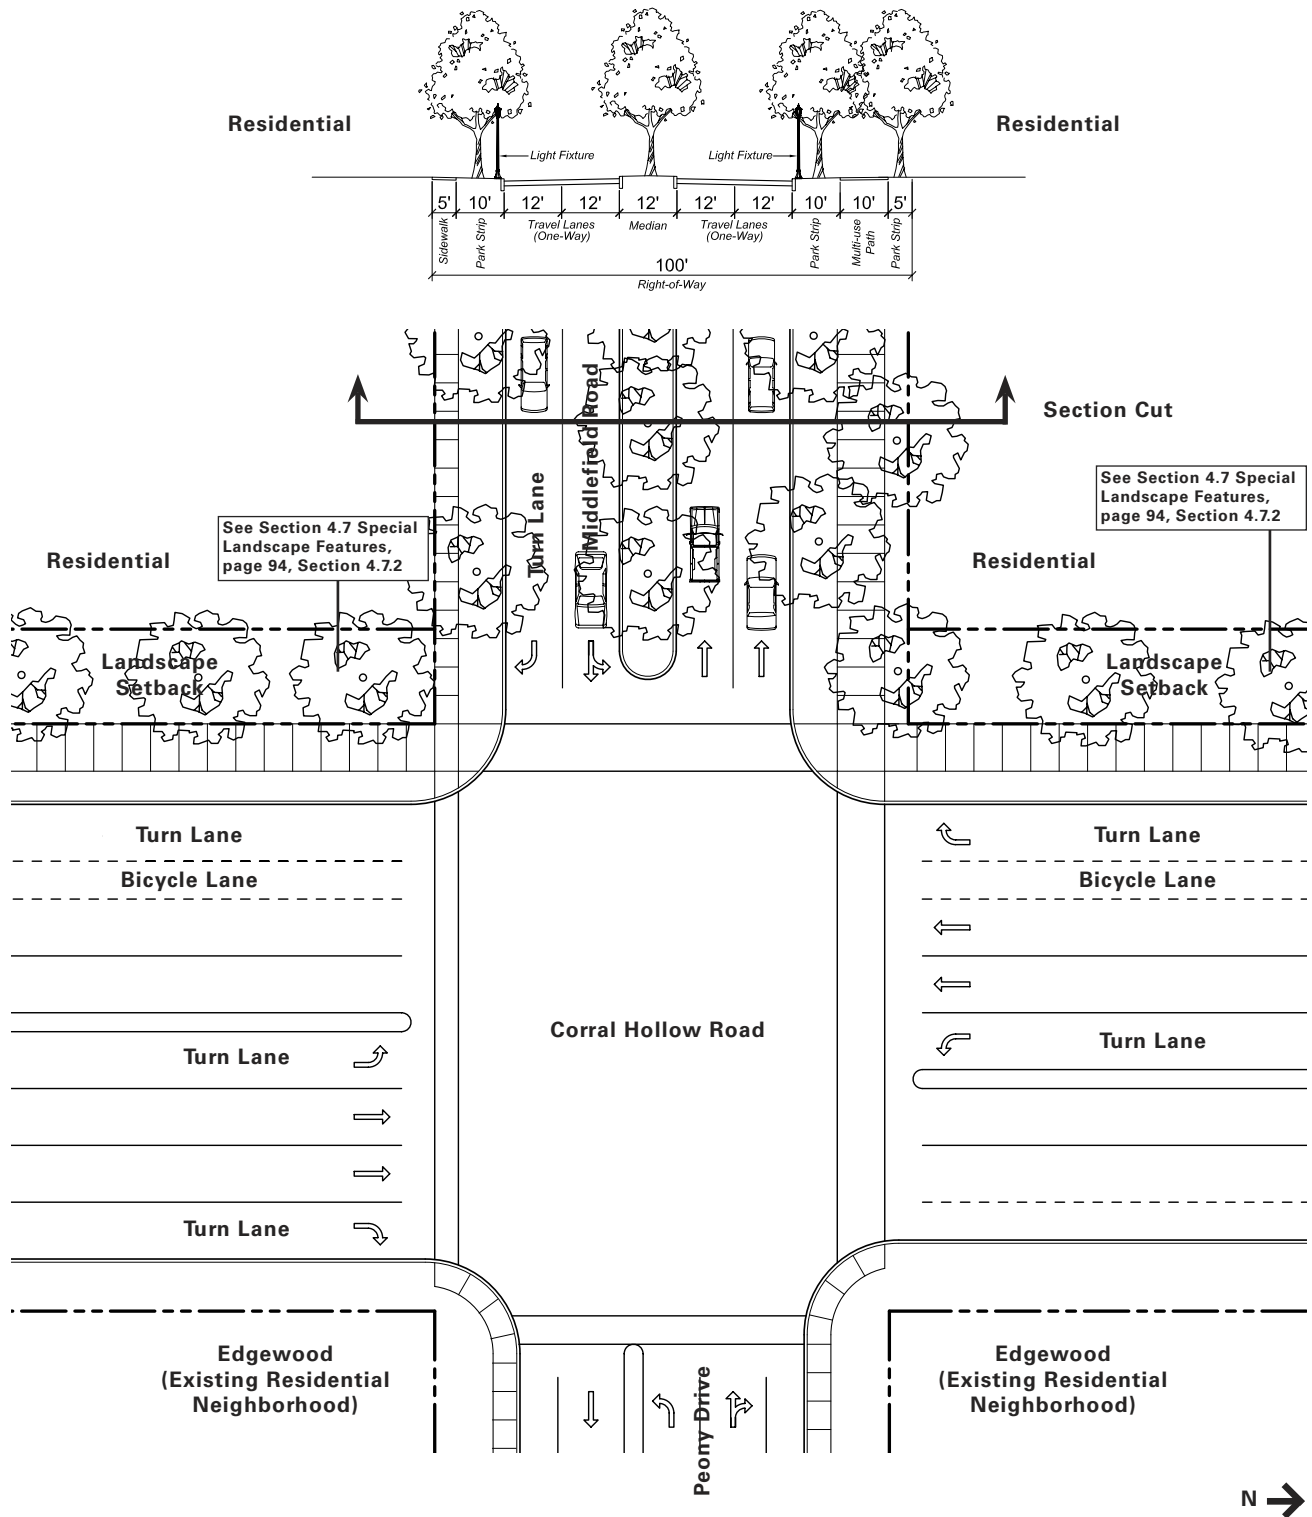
Proposed Section and Plan: Entry Street B
